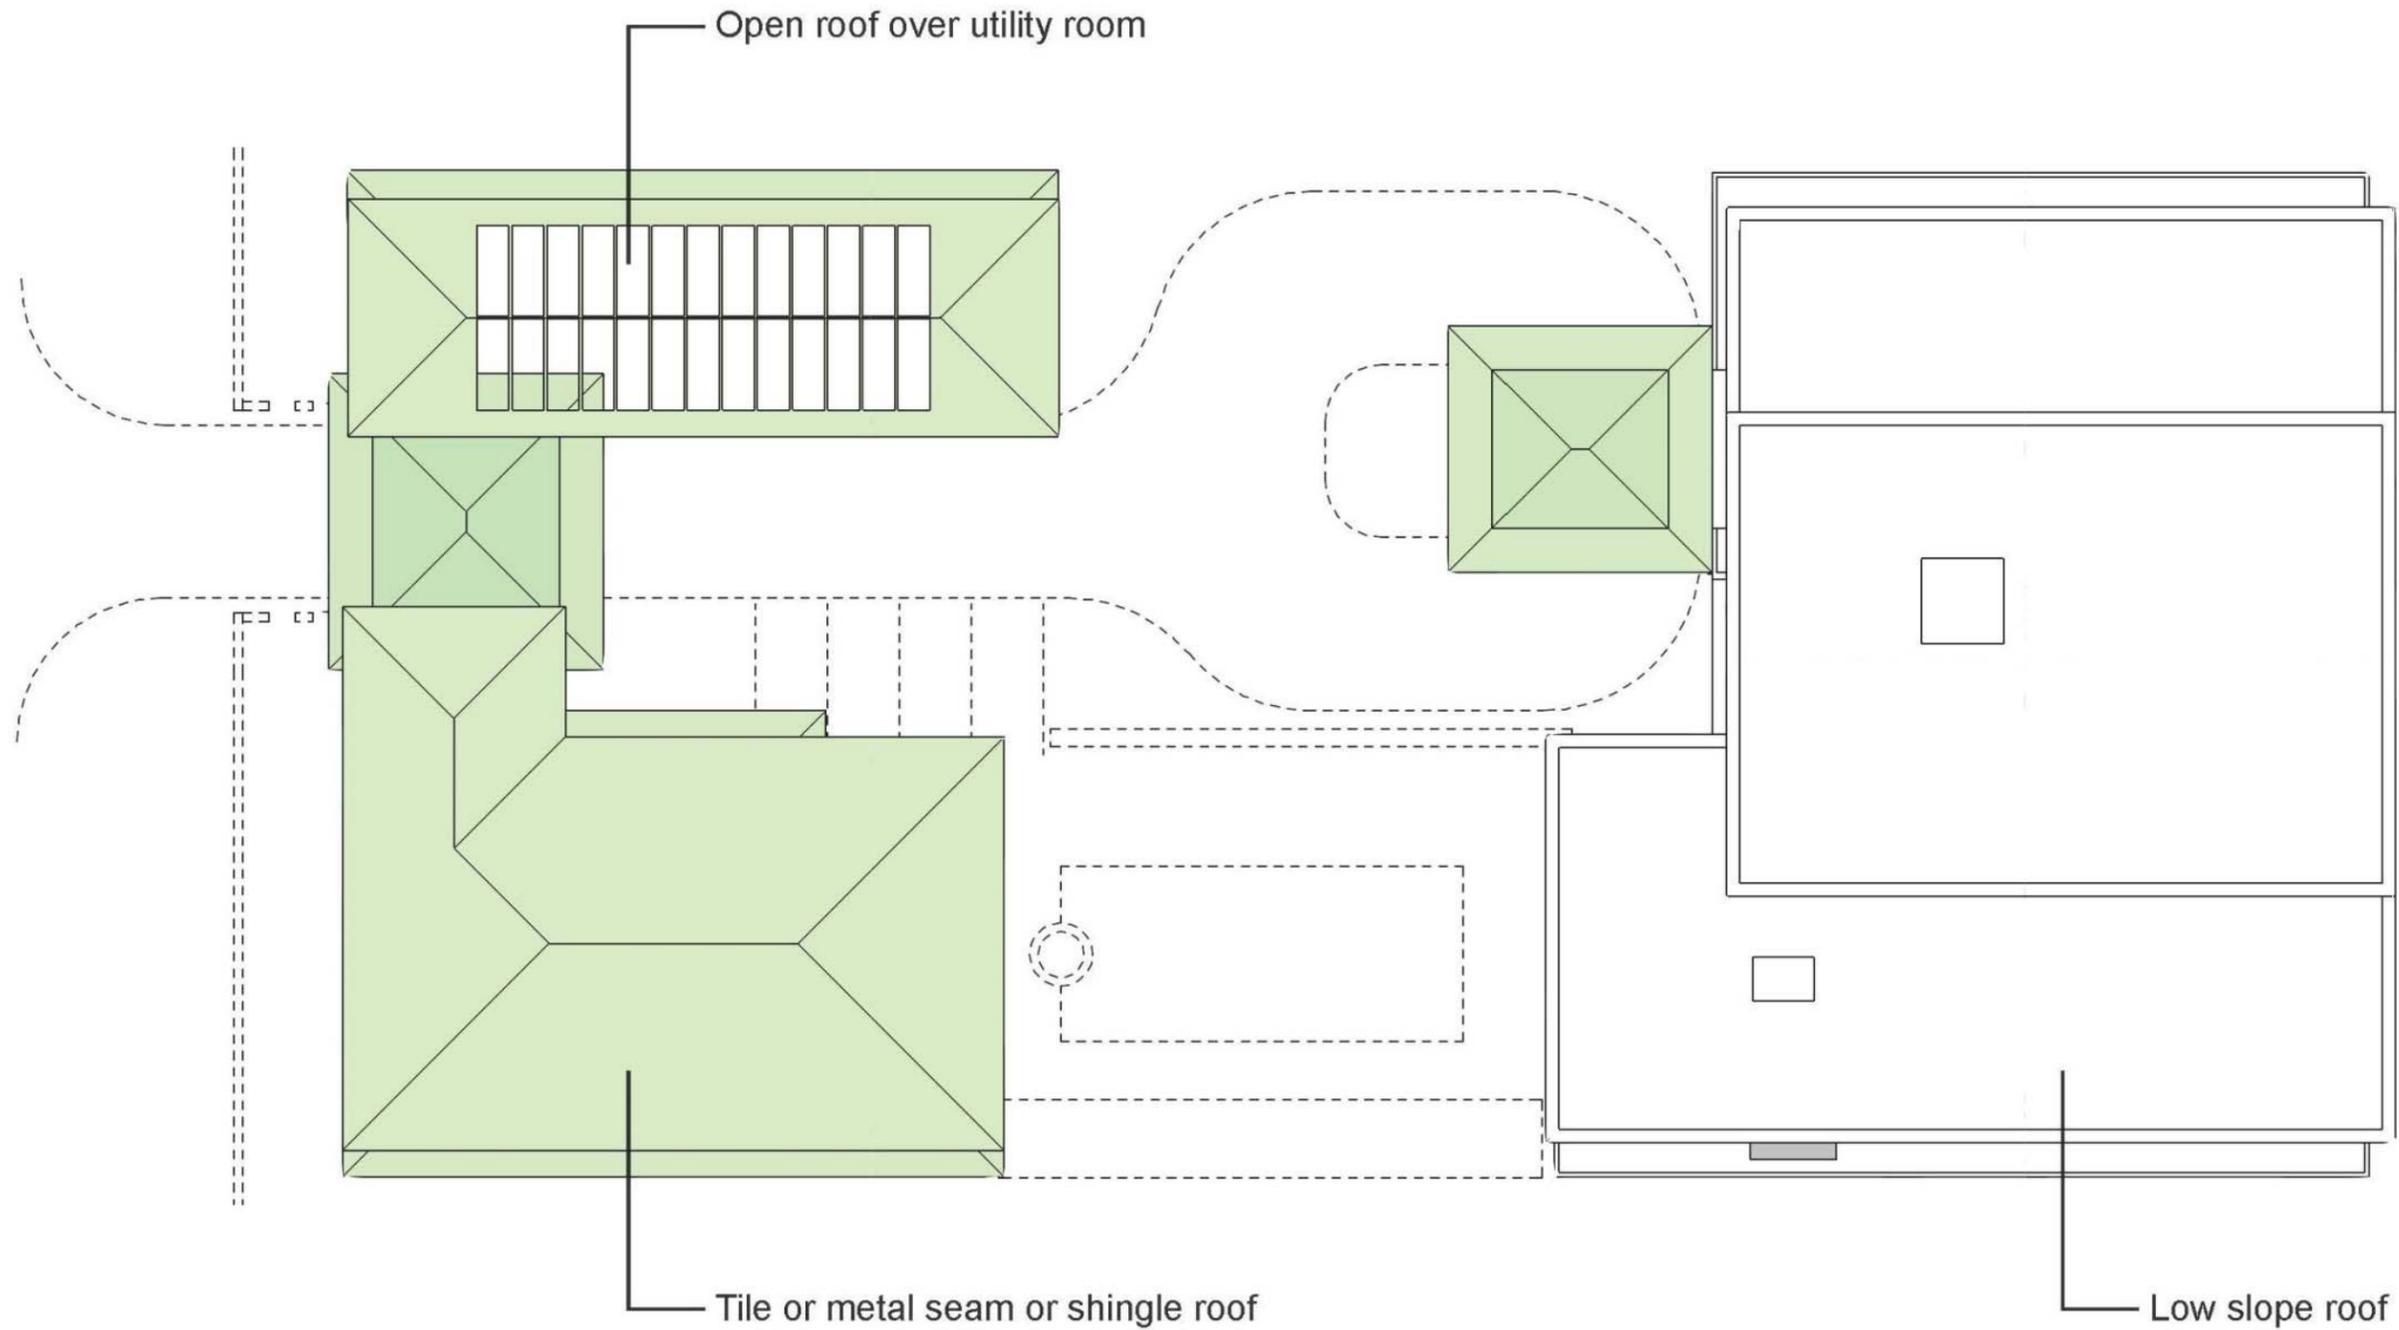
ROOF PLAN (NOT TO SCALE) (2/7/14)
